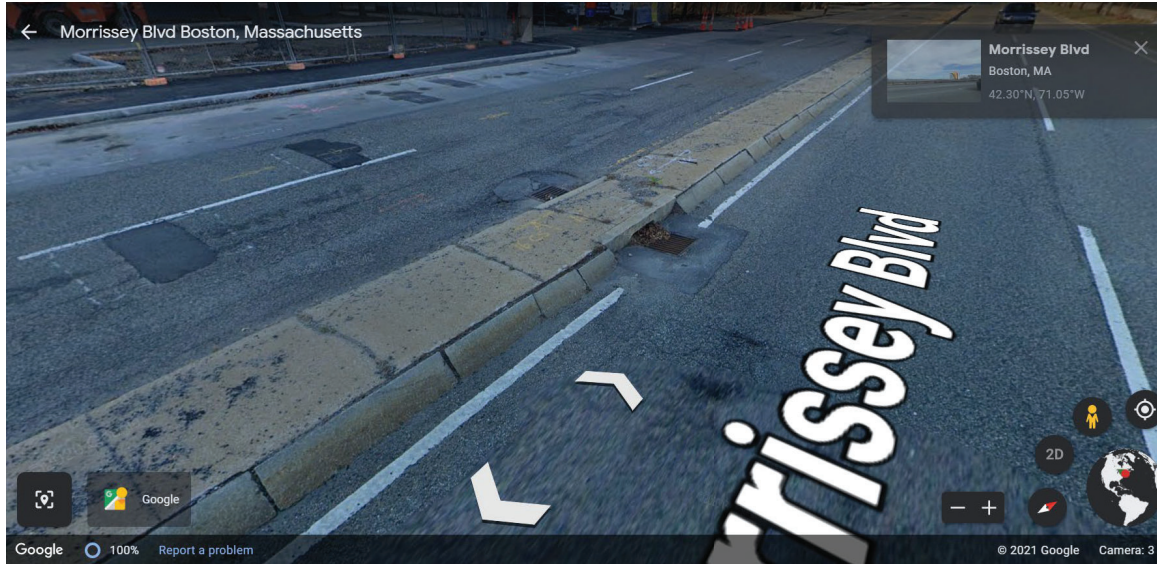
Example of existing catch basin at Morrissey Boulevard.
